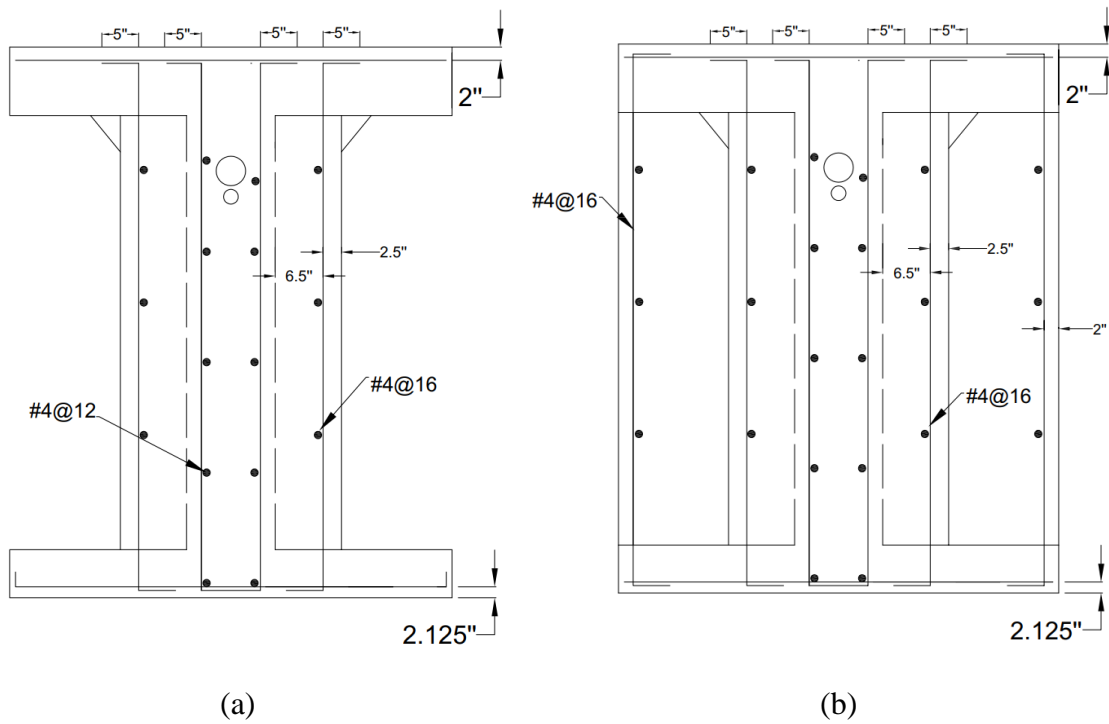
Reinforcement details at (a) Section A-A and (b) Section C-C
